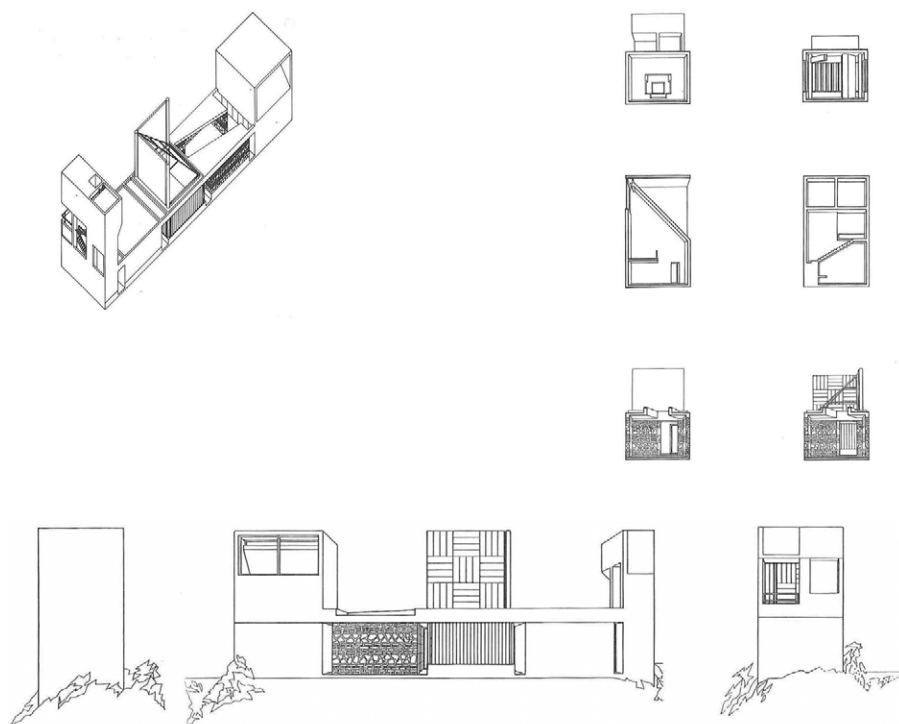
From top to bottom, left to right: Axonometry; Sections; Elevations.
